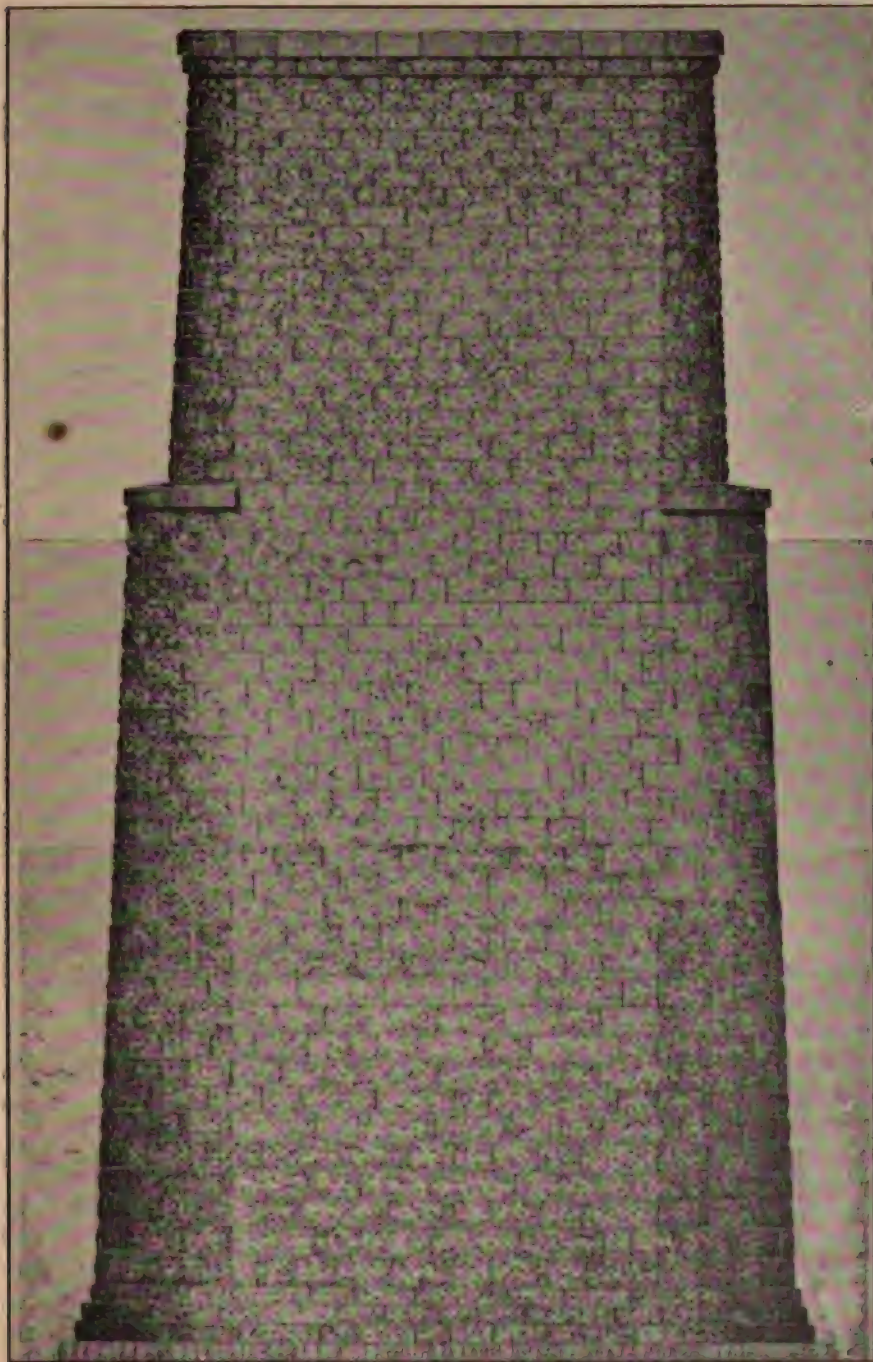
PIER OF OMAHA BRIDGE, UNION PACIFIC.
